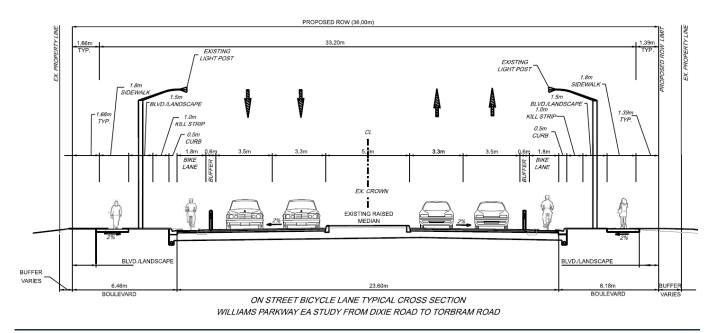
ALTERNATIVE DESIGN CONCEPT #4 - ON STREET BICYCLE LANE TYPICAL CROSS SECTION
